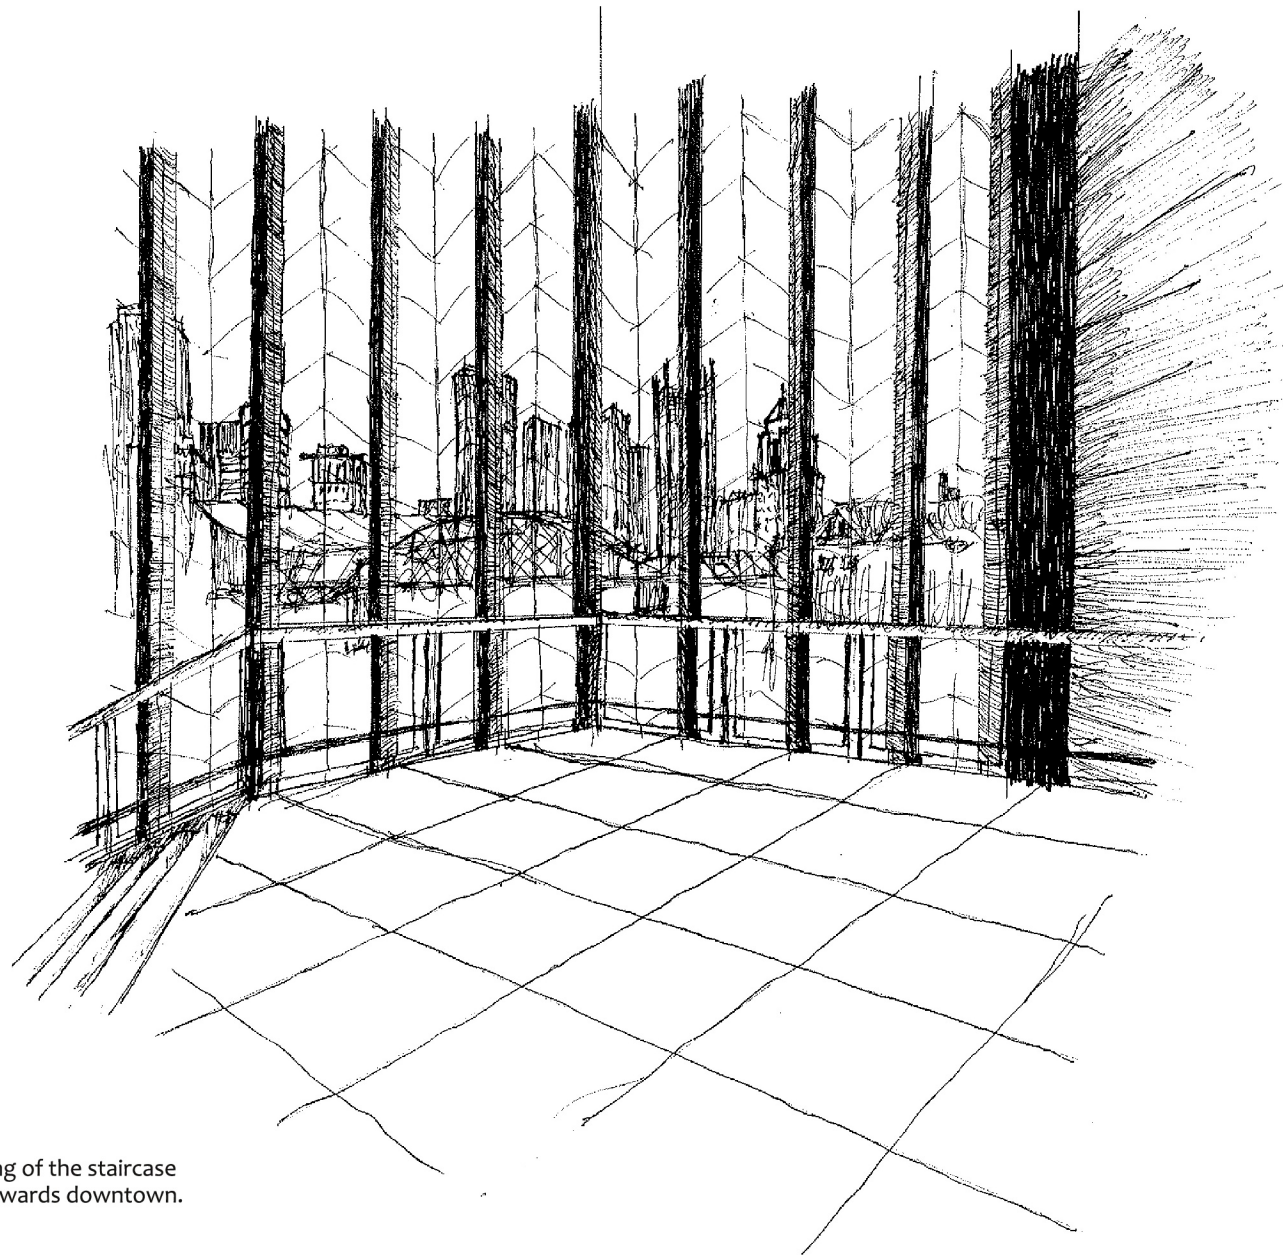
, Standing on the landing of the staircase looking out the curtainwall towards downtown.
